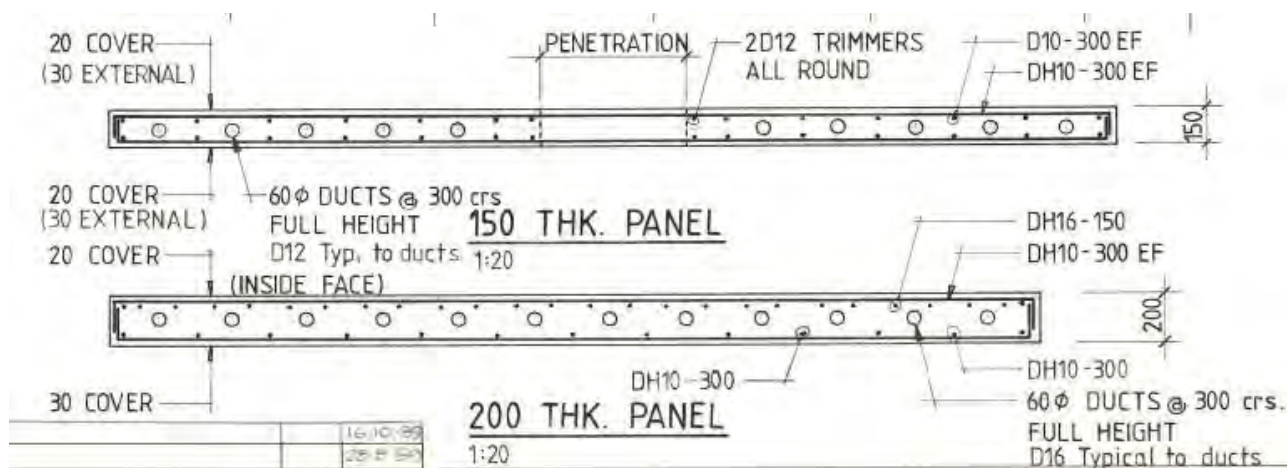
Extract from the as-built drawing S7 - showing the precast concrete wall panels in section
